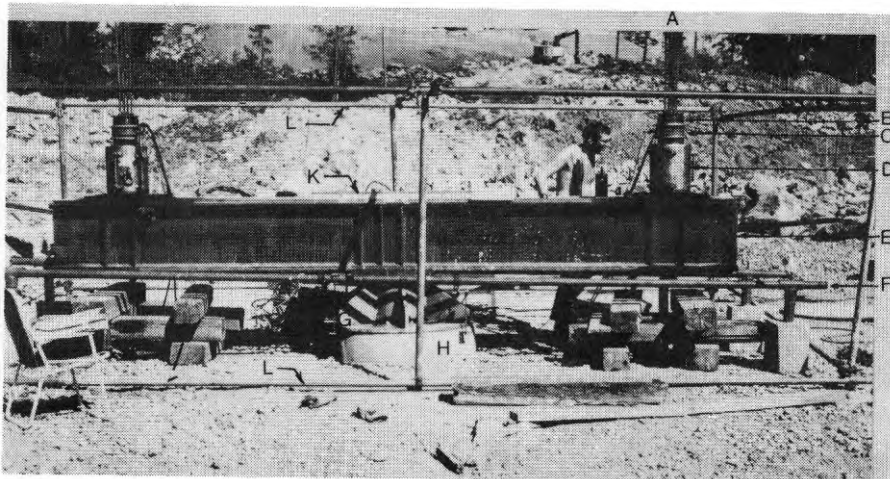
Plate tests in the field. Test equipment fully erected (tarpaulin removed). A, drawbar; B, anchorage; C, force recorder; D, jack; E, girder; F, pipe; G, thrust cover; H, concrete slab; K, spirit level; L, tubular frame.
